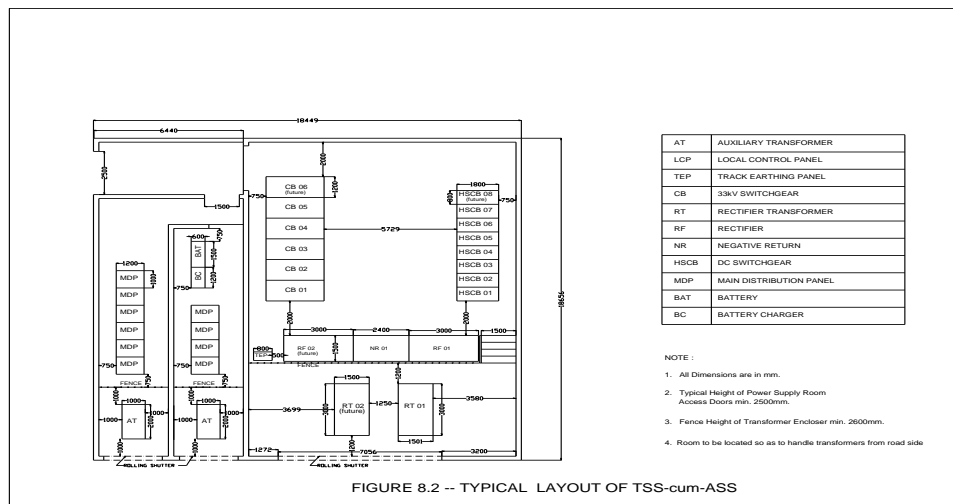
TYPICAL LAYOUT OF TSS-cum-ASS
